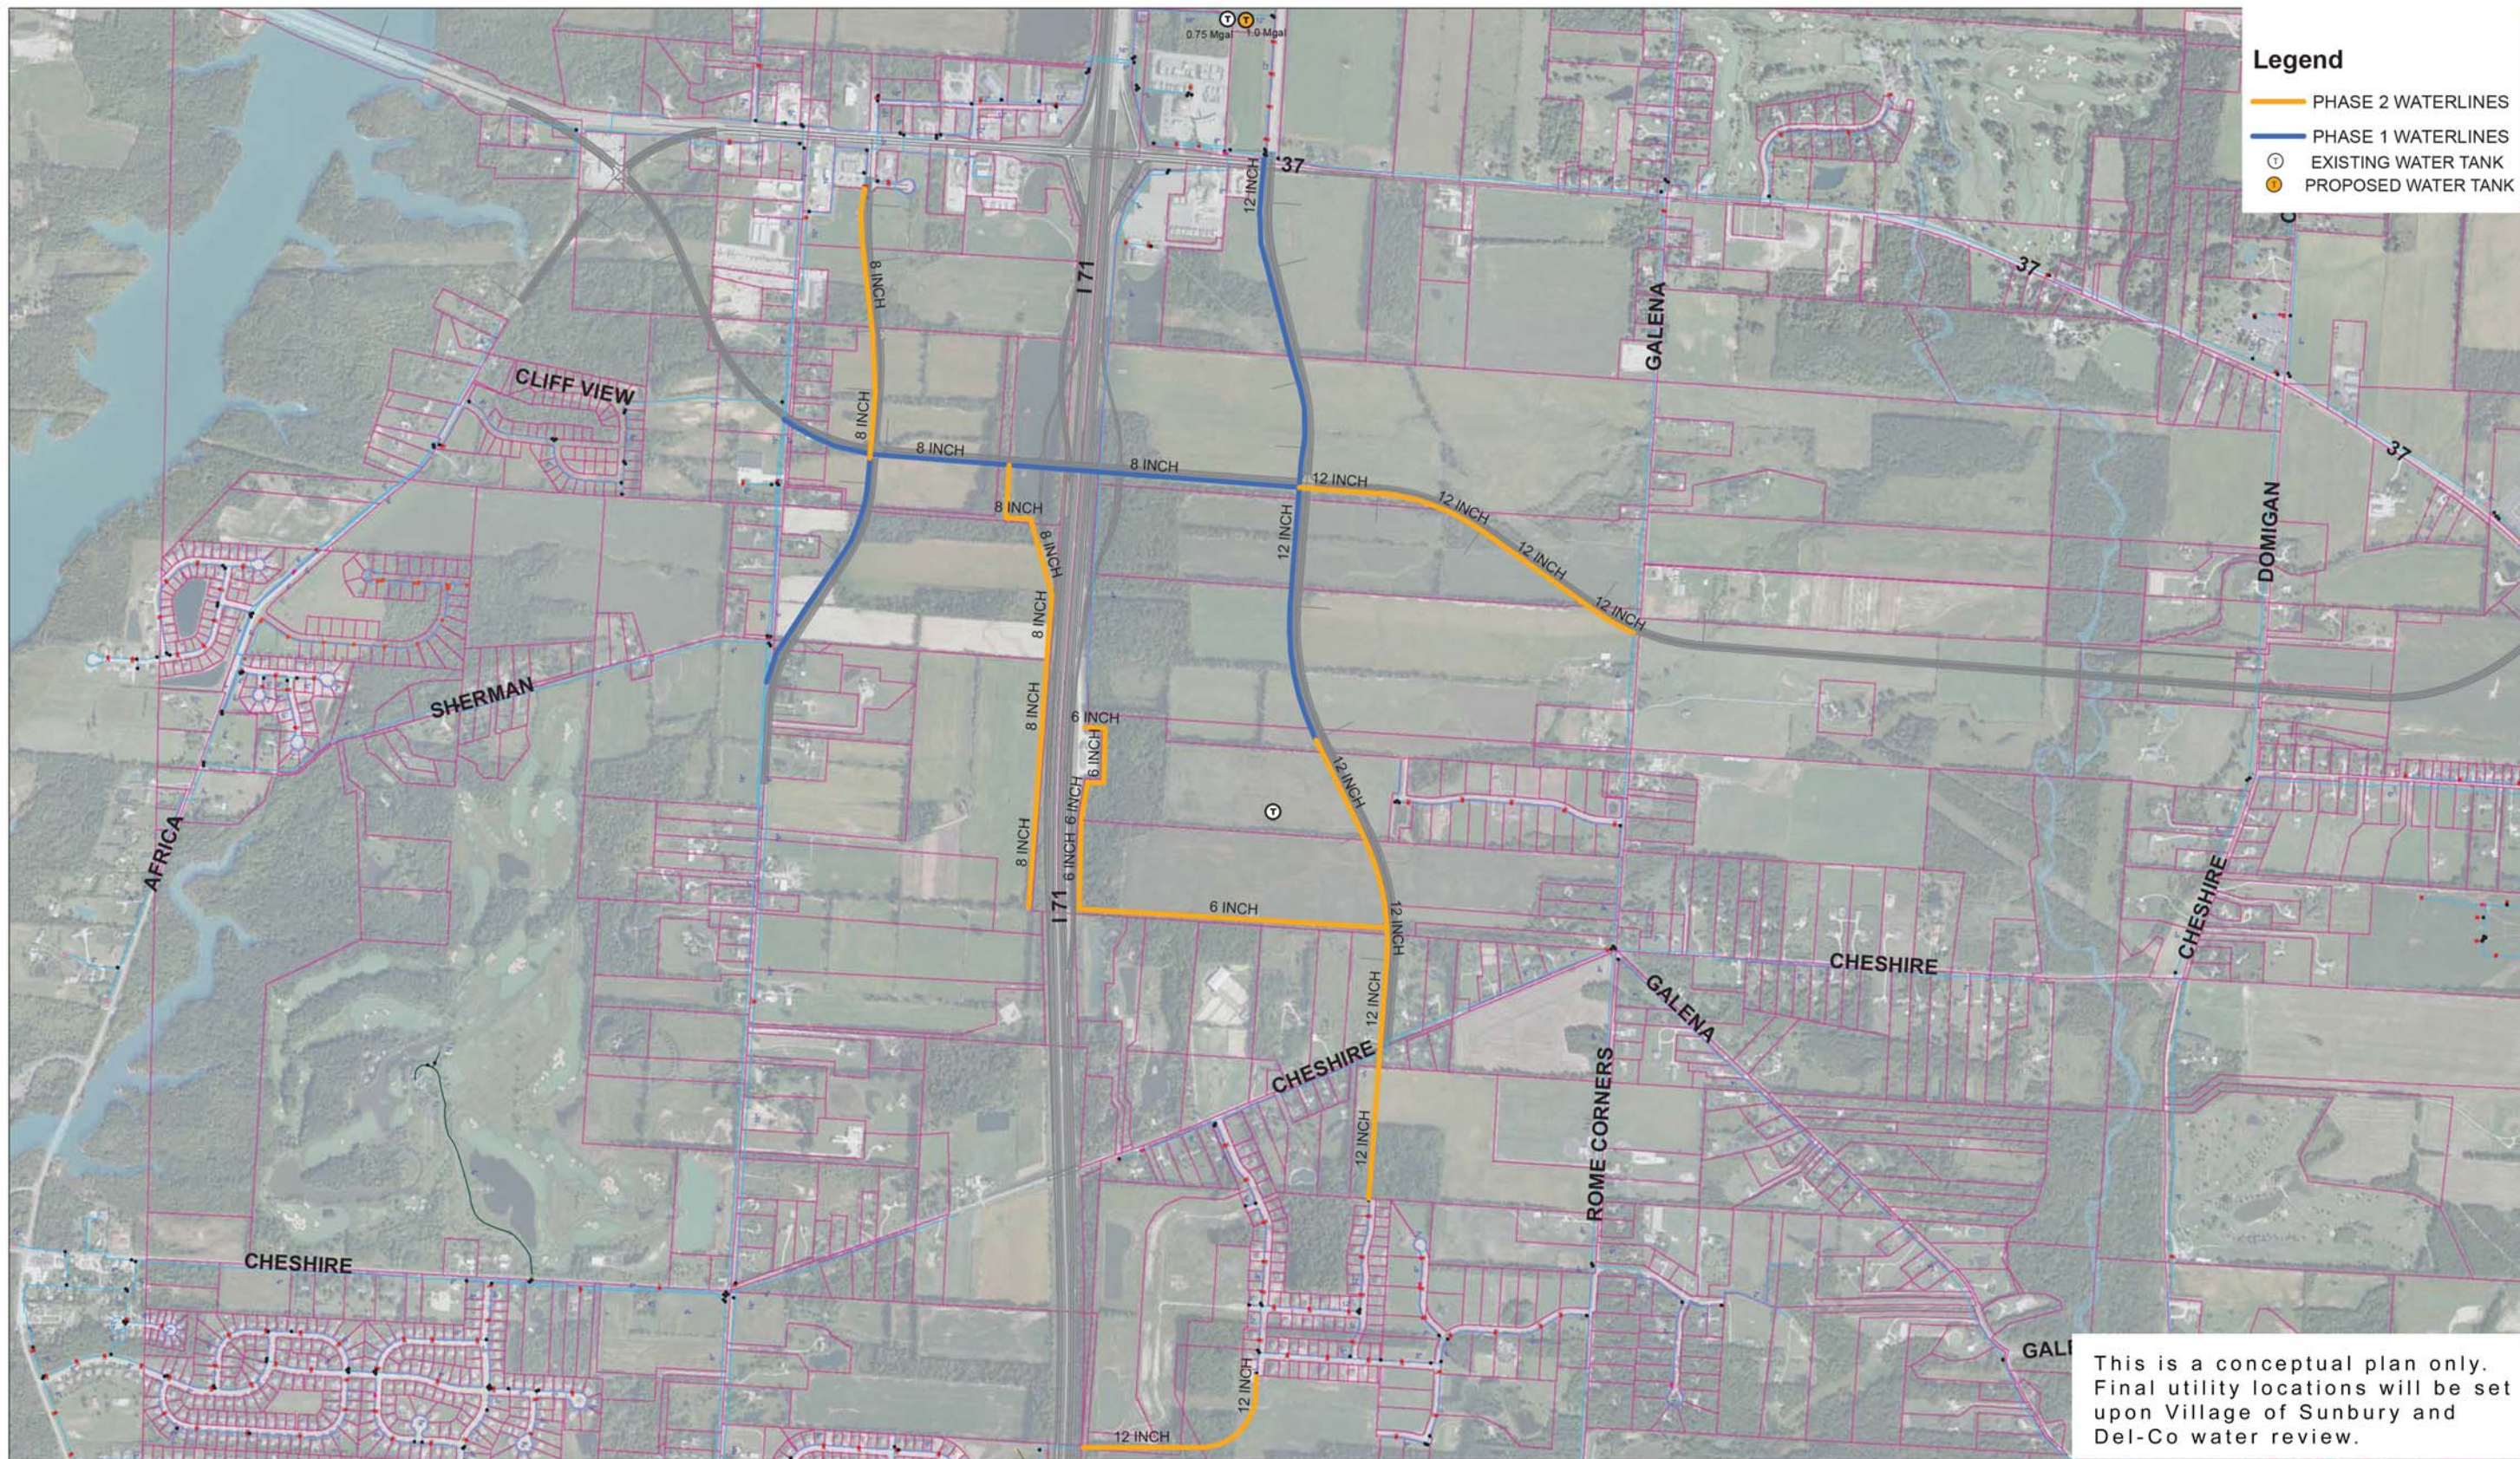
EXHIBIT F - PRELIMINARY UTILITIES PLAN - WATER
